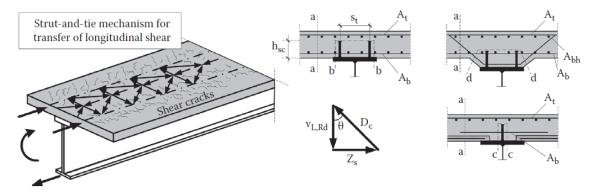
Failure mechanism and typical sections for checking shear failure (Vayas & Iliopoulos, 2013)
